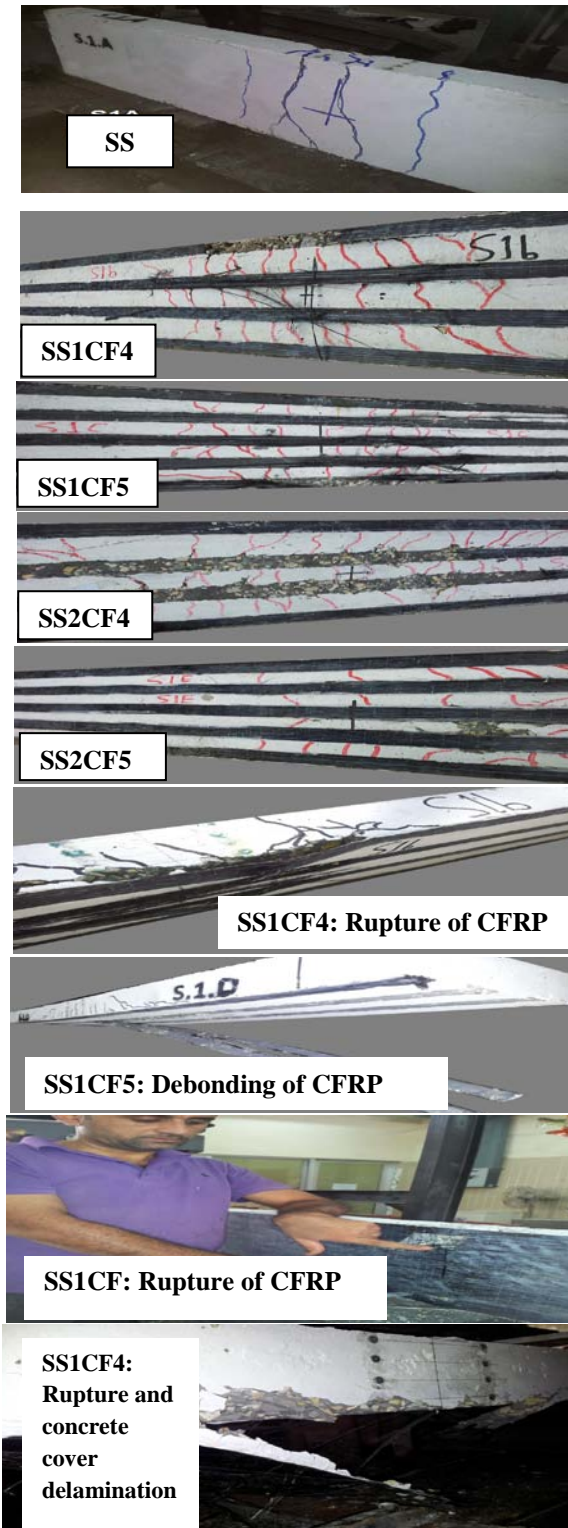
Crack Patterns and Failure modes of strengthened sand-PLWAC OWS under static loading.
